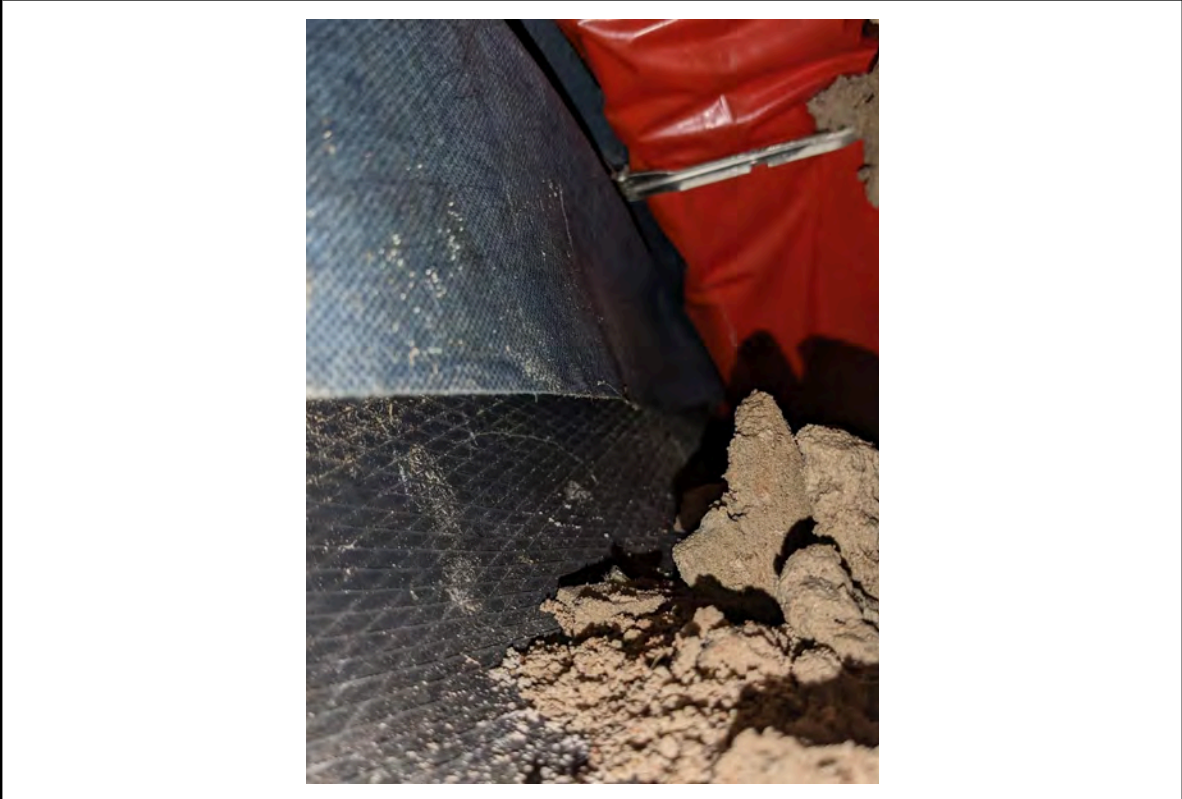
Location 11 - Cavity with barriers, wall ties, damp proof membrane and breather membrane
